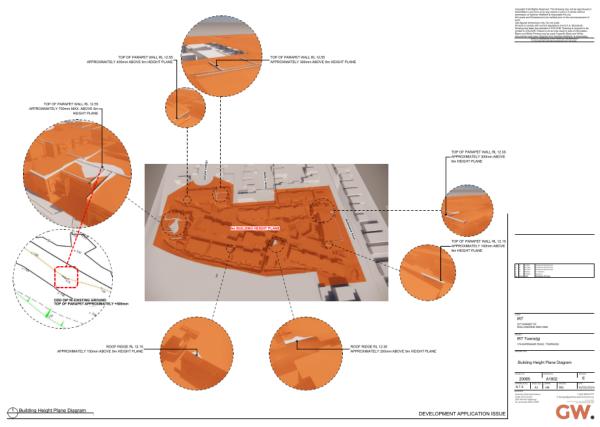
BUILDING HEIGHT PLANE DIAGRAM (GW ARCHITECTS)
